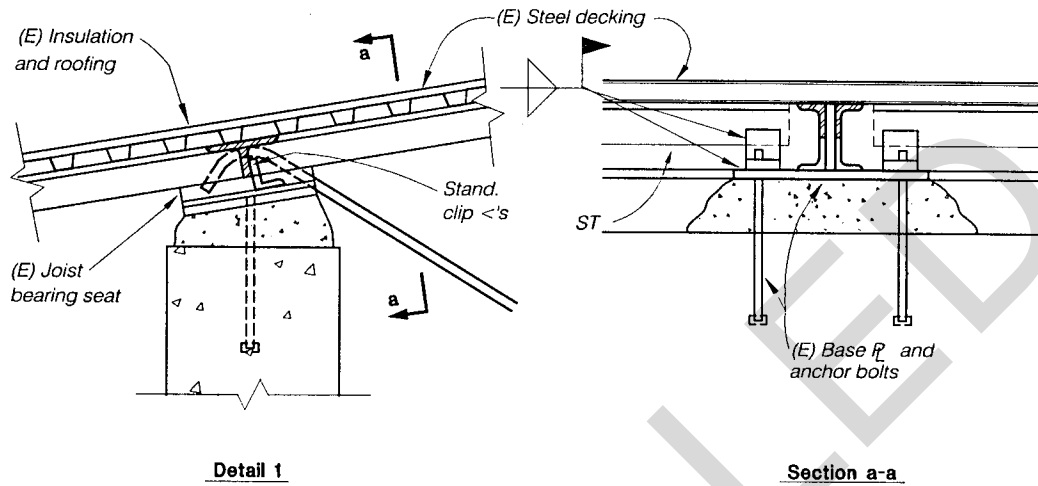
Providing Shear Transfer for Steel Decking on Steel Joists at Exterior Wall
